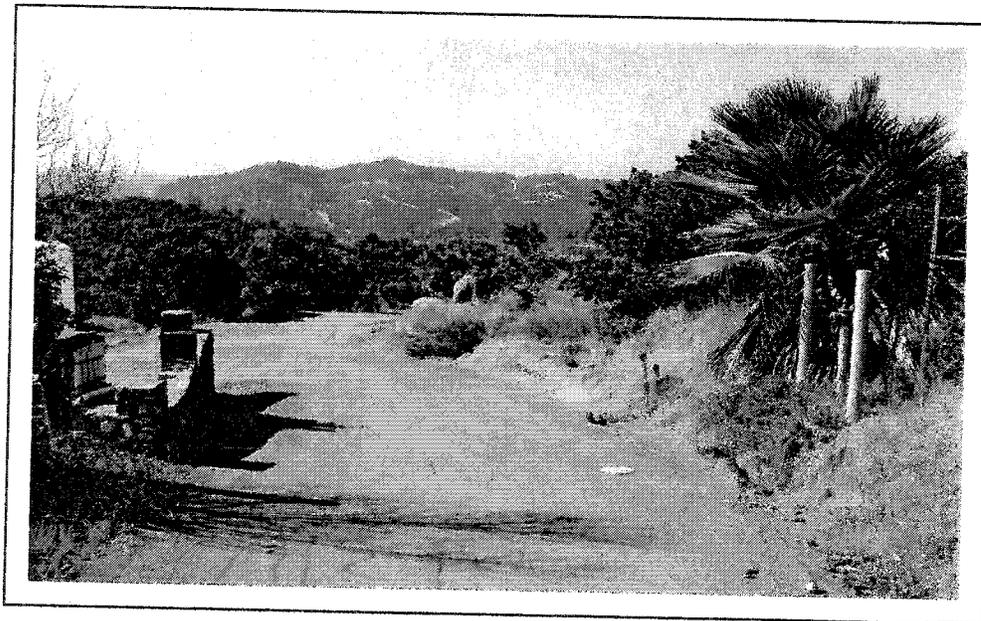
View looking west from the private road easement into the Fitzpatrick Development
